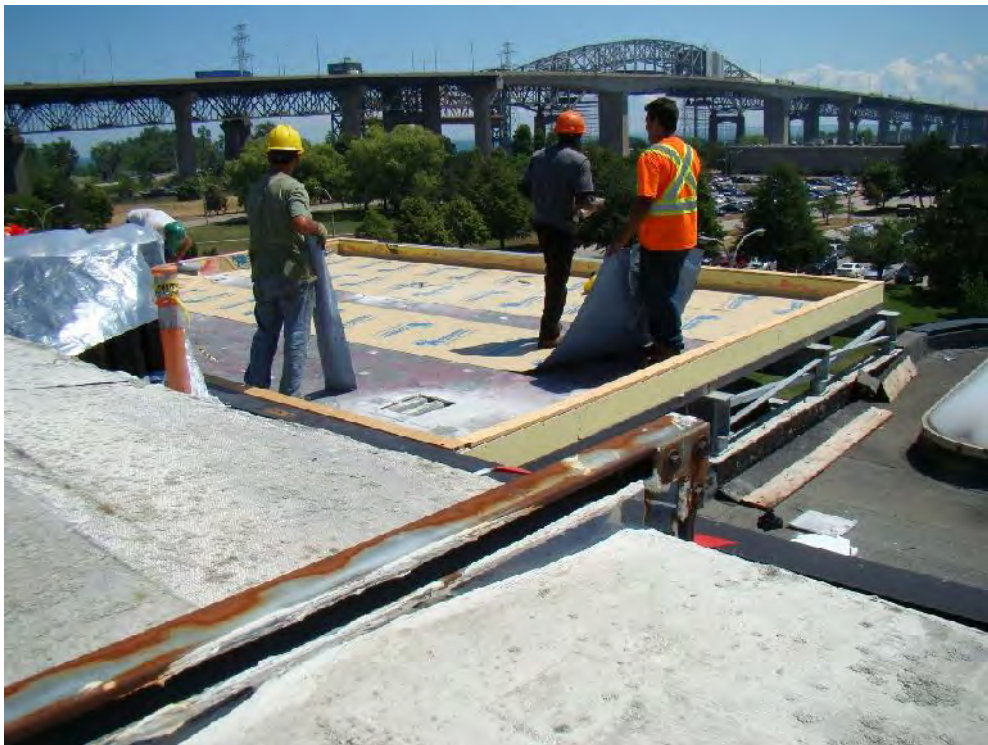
Roof Area 3.1 – The existing waterproofing application over mechanical ductwork was assessed to be in poor condition.
